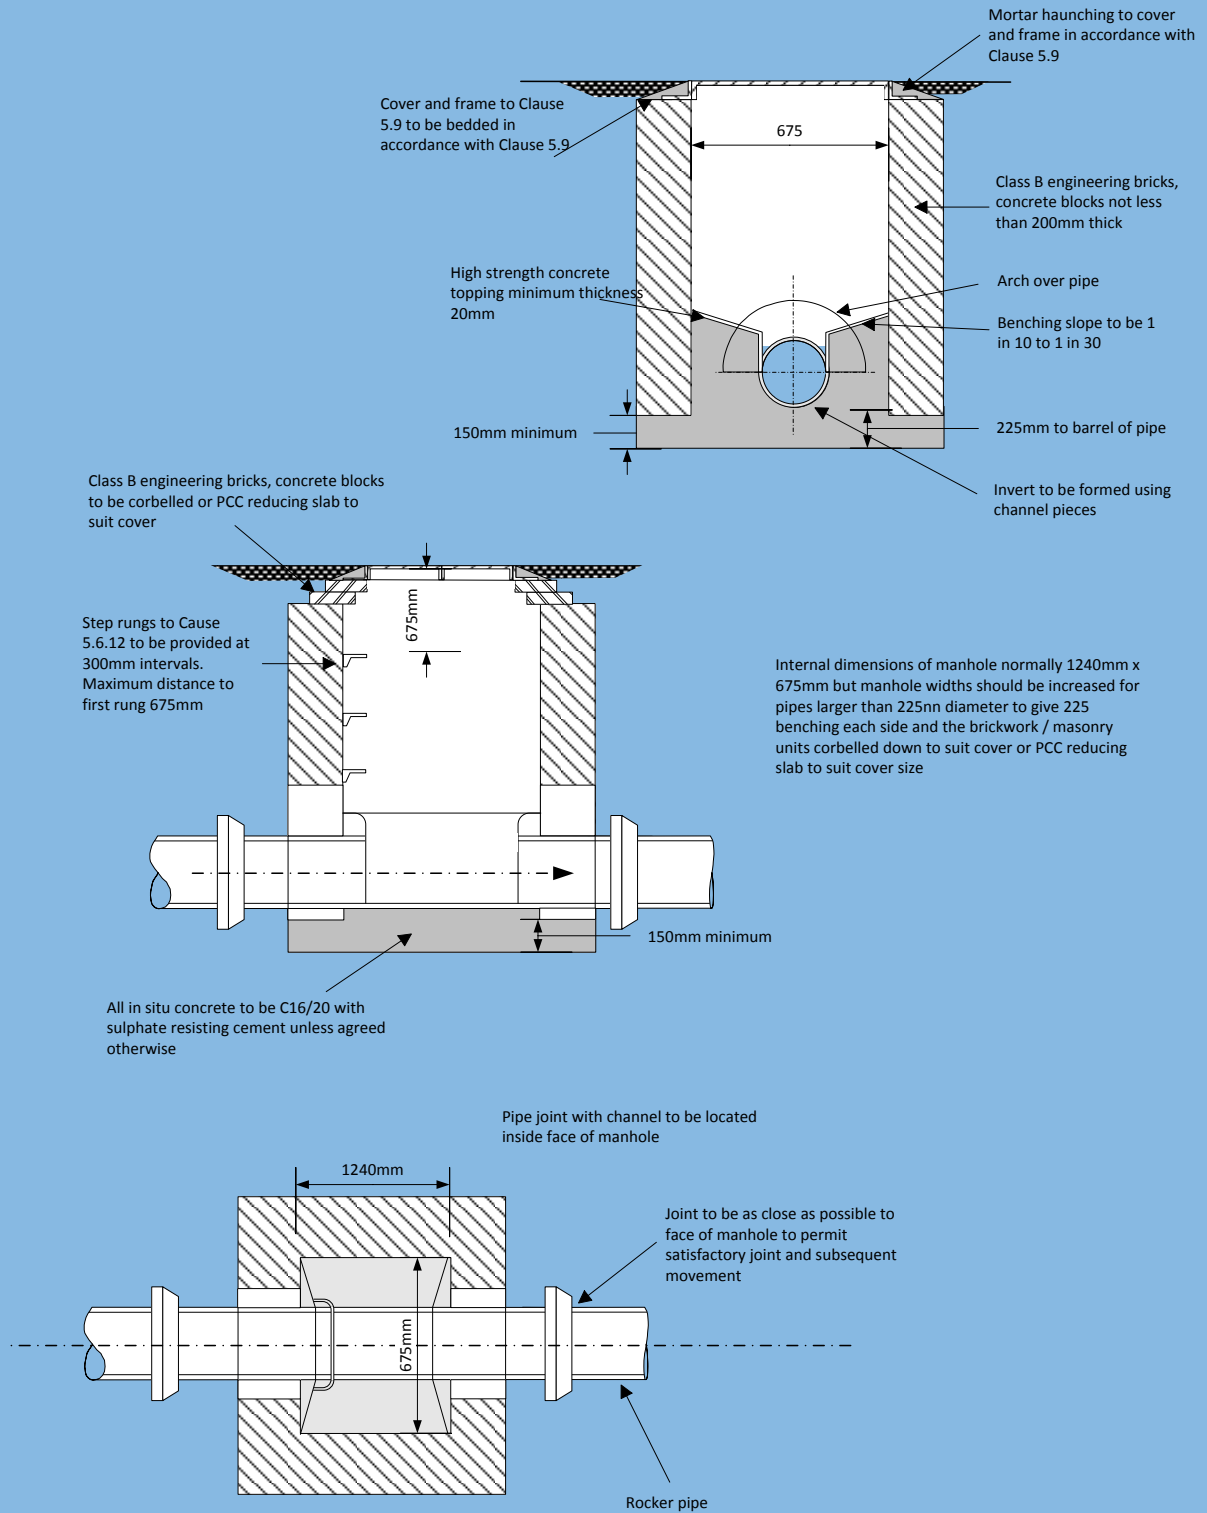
/4 - TYPICAL MANHOLE DETAIL - TYPE D
